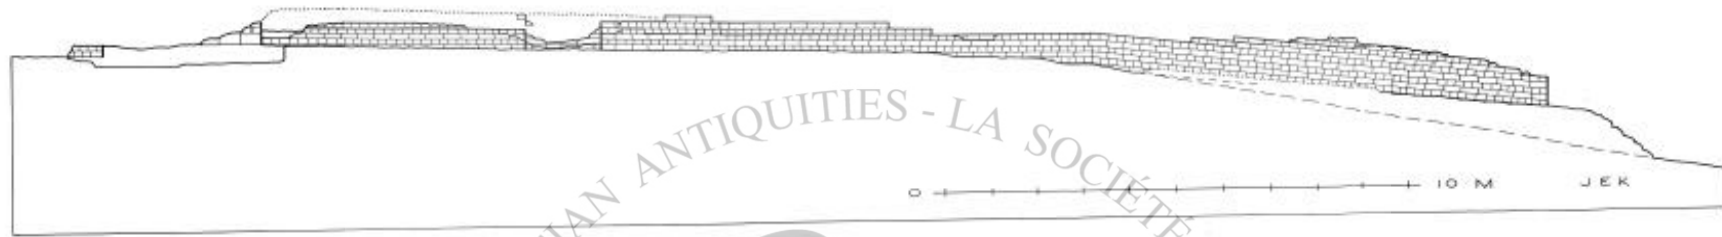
The East Gate and Approach Passage: Section/Elevation, looking N.
